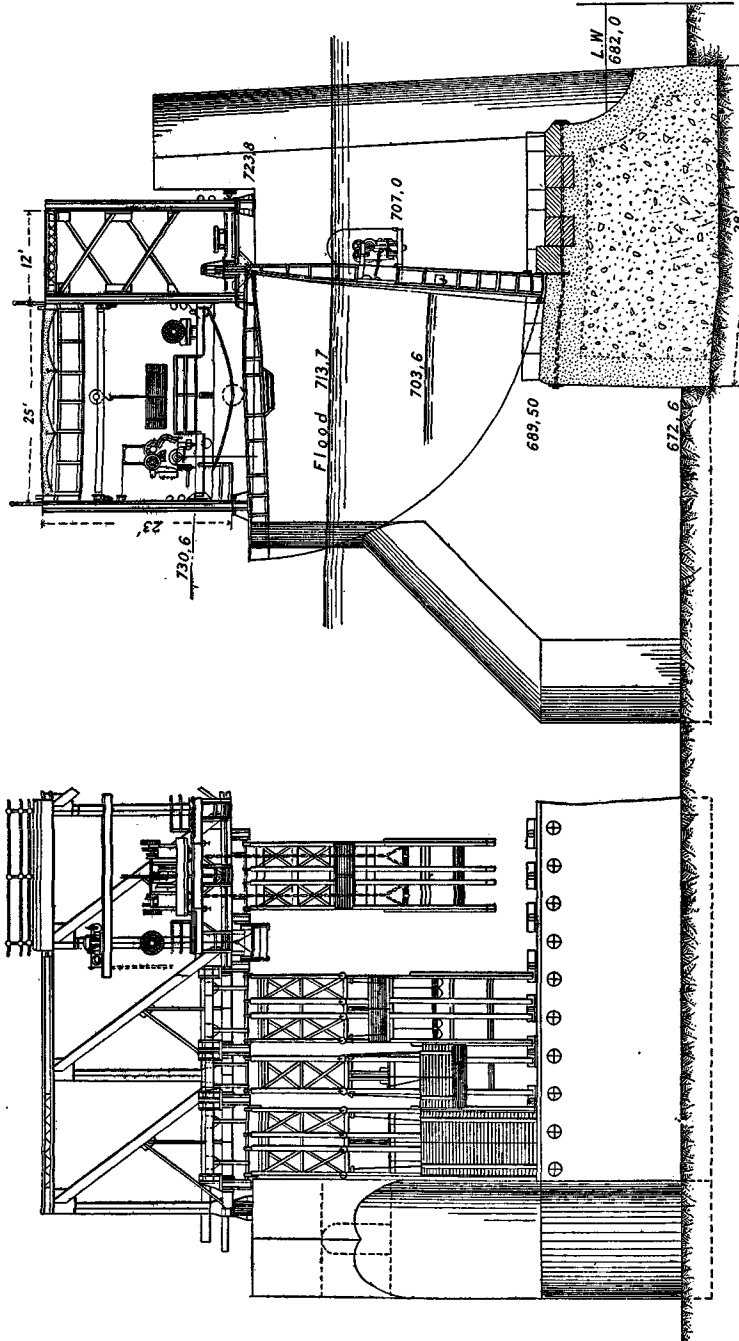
“Caméré” Curtain Dam at St. Andrew's Rapid, Red River, Man.
